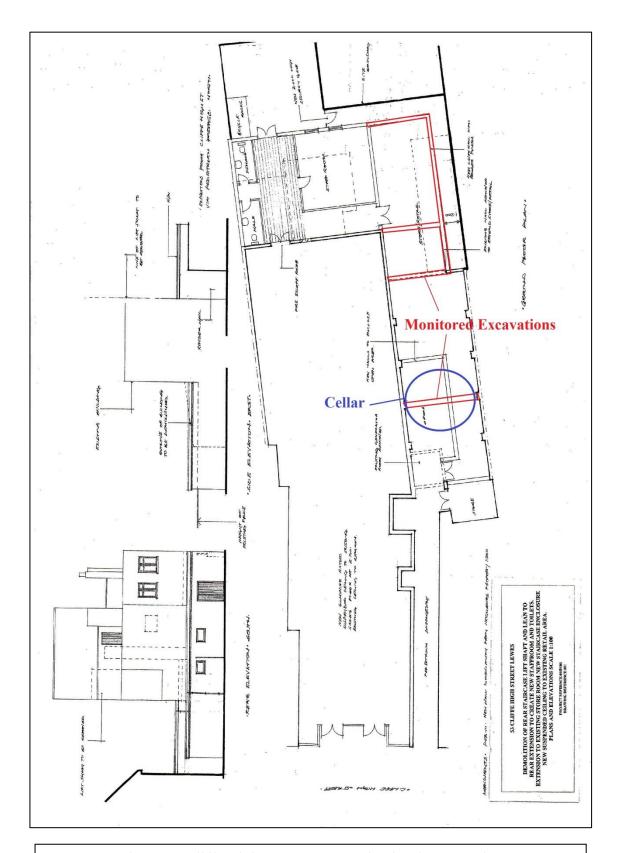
53 Cliffe High Street, Lewes: Site development plan
